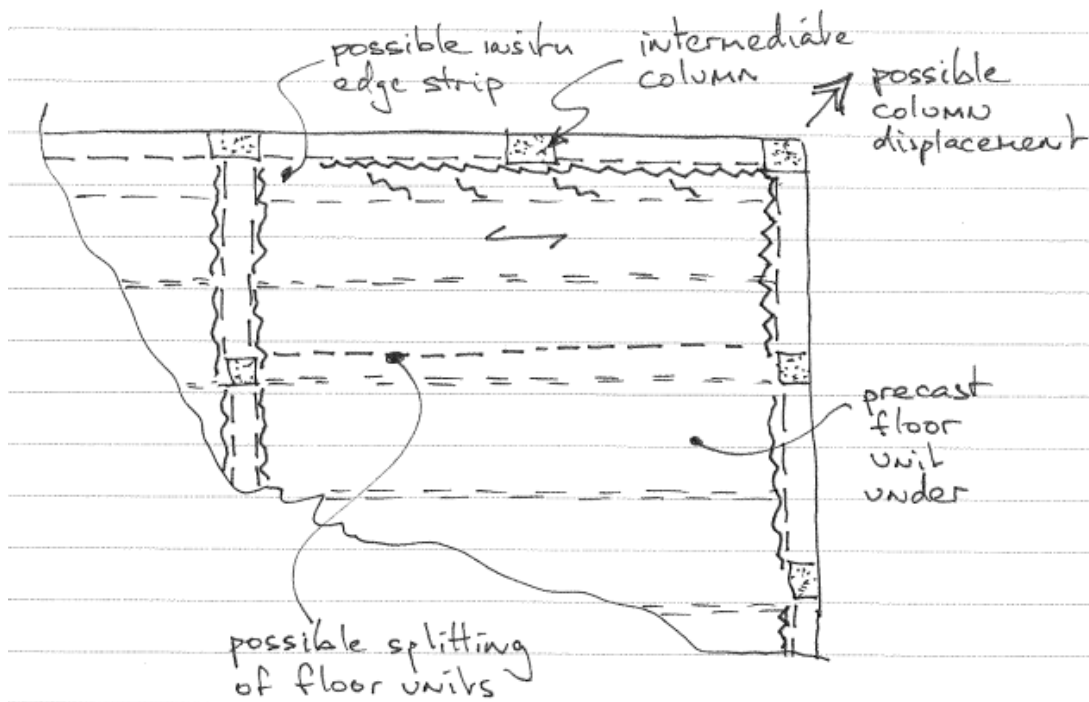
Ductile Concrete Moment Frame with Precast Floors
